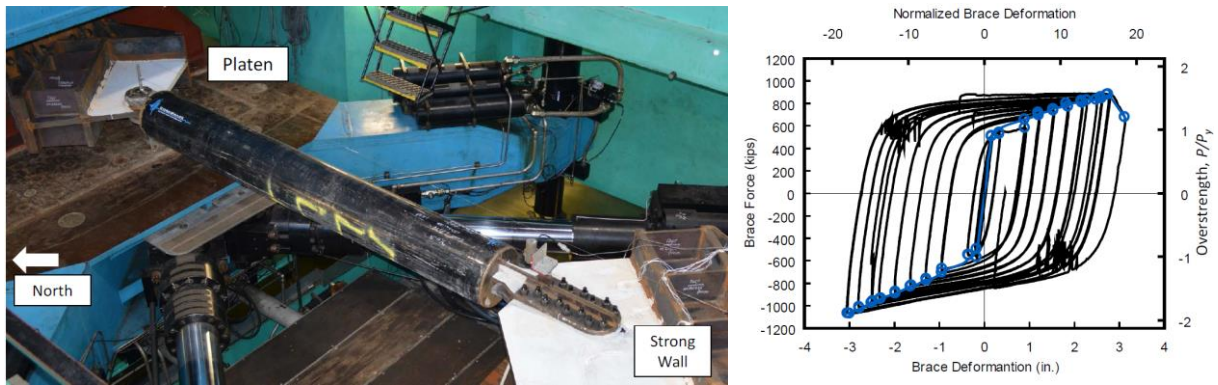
BRB connection testing (photograph provided by Corebrace / UCSD): a) Test setup; b) Force-displacement of Test Specimen 1 (without out of plane displacement demand).
